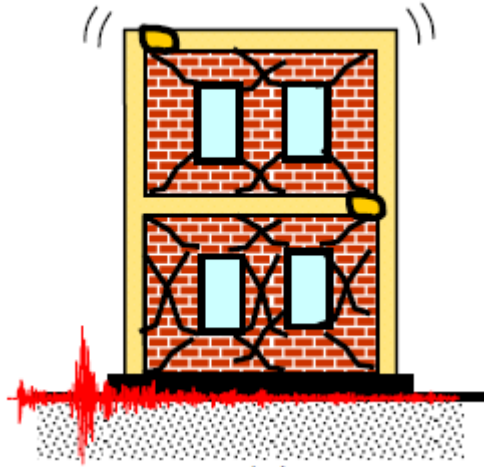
(b) Moderate Shaking – Minor structural damage, and some non-structural damage
